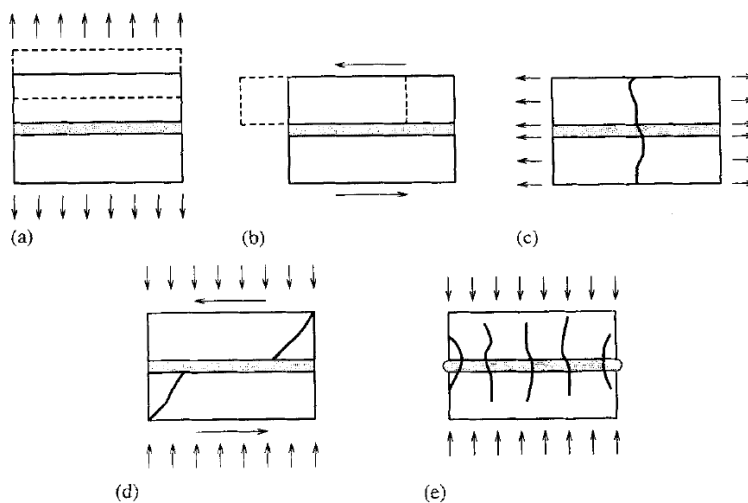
Masonry failure mechanisms (from [58]): (a) joint tensile cracking; (b) joint slipping; (c) unit direct tensile cracking; (d) unit diagonal tensile cracking; (e) masonry crushing.
